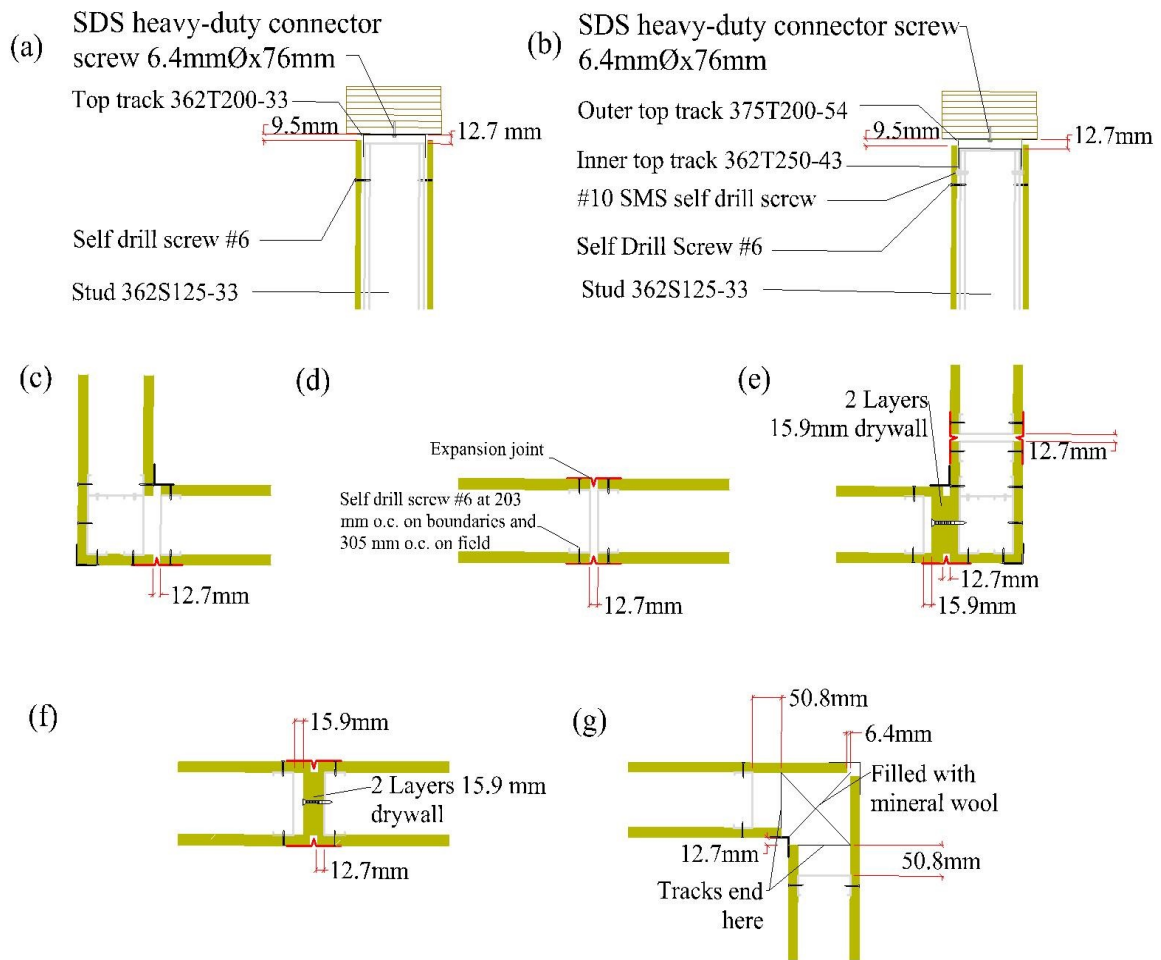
Details adopted in phases 1 and 2 for damage reduction; (a) Slip-track connection, (b) Telescoping connection, (c) Wall intersection non-fire-rated expansion joint, (d) Interior non-fire-rated expansion joint, (e) Wall intersection fire-rated expansion joint, (f) Interior fire-rated expansion joint, (g) Corner gap detail
